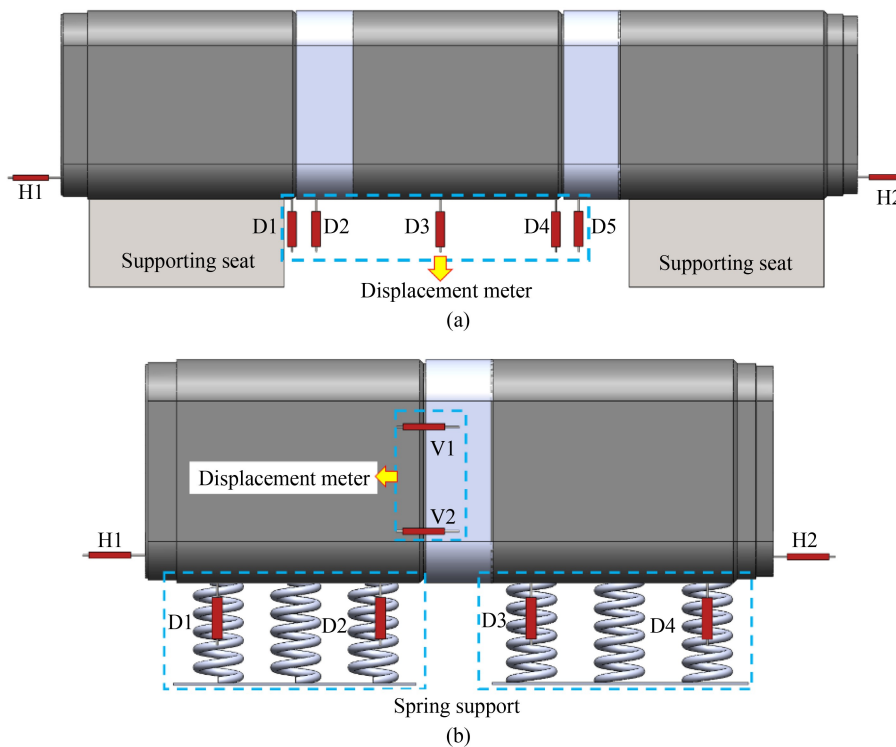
Displacement sensor layout: (a) joint shear test; (b) joint bending test.
